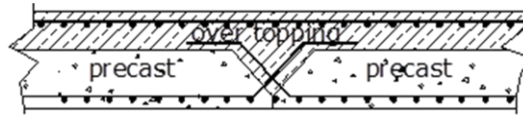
The Common Simple Connection Applied between the Precast Slab Concrete Components
